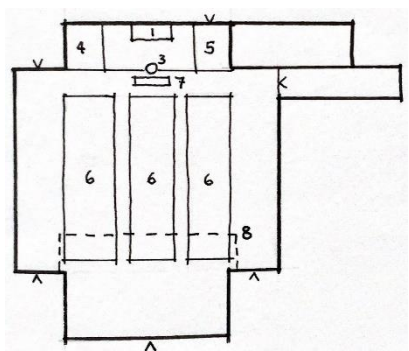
Plan from layout of Innesdal Reformed Church (Author, 2023).
